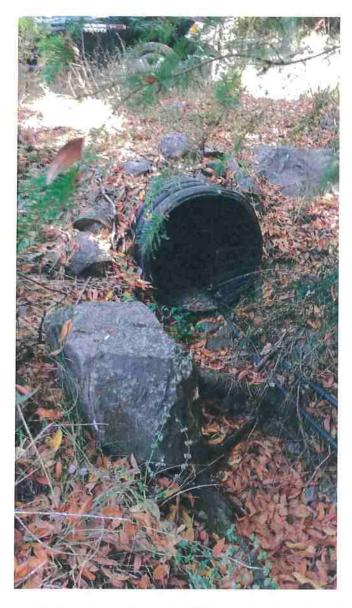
Stream Crossing #7, view of 24-in diameter HDPE culvert outlet. Culvert is properly aligned with the natural grade of the stream channel, and is resting on large roots of nearby conifer.
